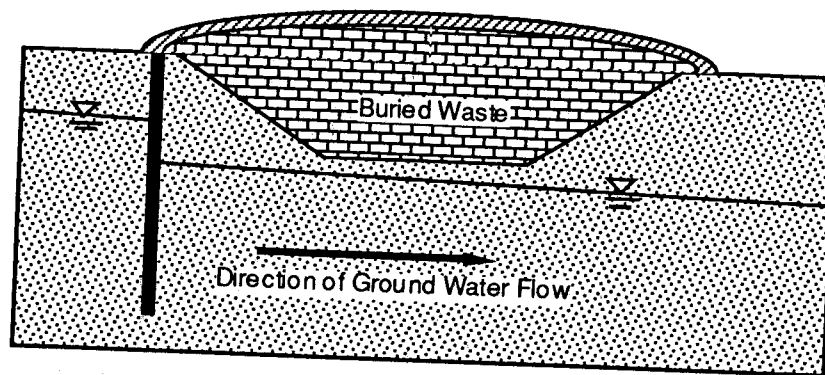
Example of Vertical Cutoff Wall to Limit Flow of Ground Water through Buried Waste.
